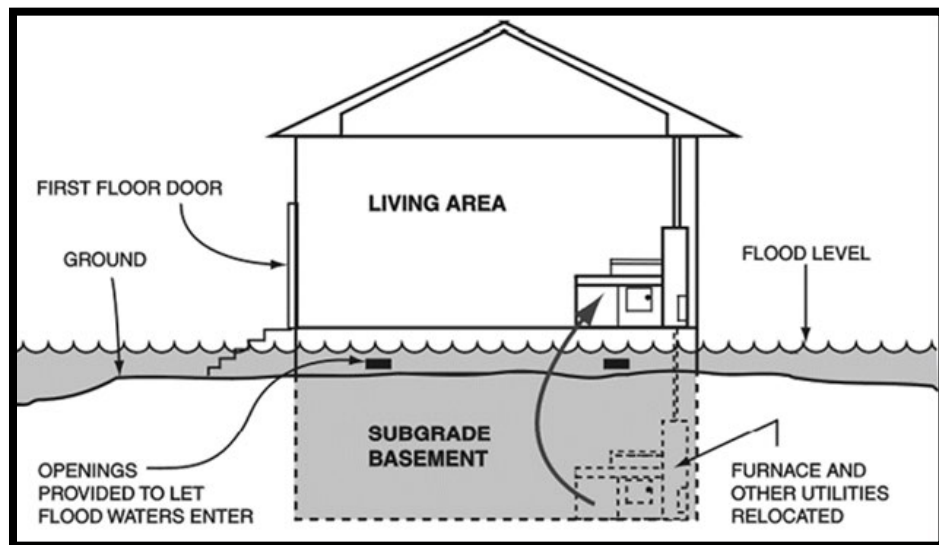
Depiction of Wet Floodproofing (FEMA 551, 2007)
